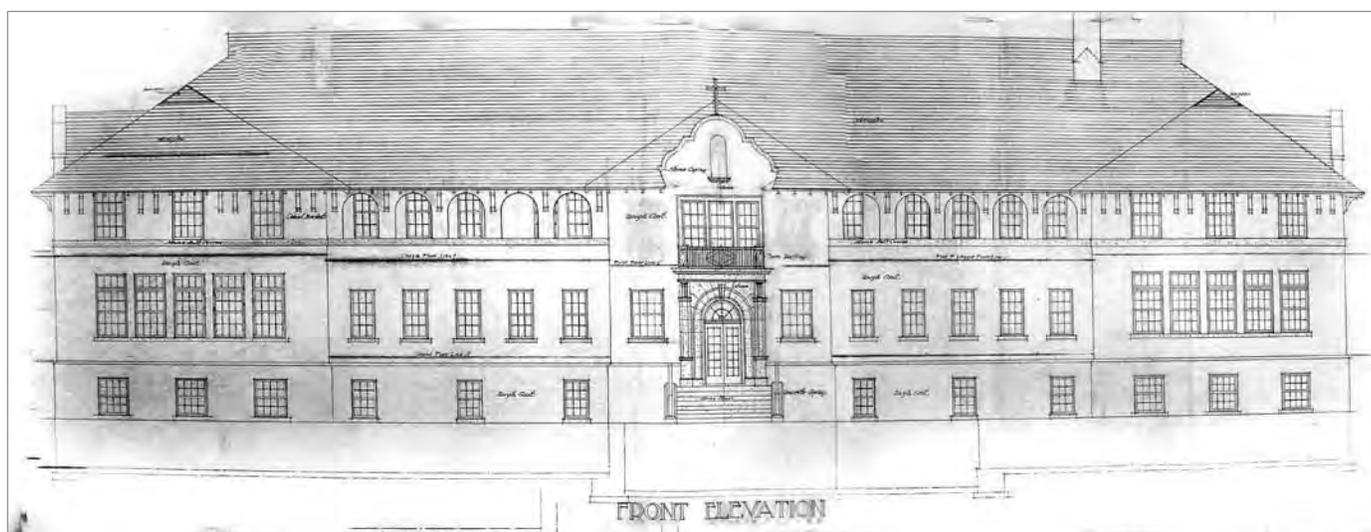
ARCHITECTURAL PLAN: ST. EUGENE INDIAN RESIDENTIAL SCHOOL, 1911, ALLAN KEEFER, ARCHITECT. FAÇADE ELEVATION. | © INDIAN AND NORTHERN AFFAIRS. REPRODUCED WITH THE PERMISSION OF THE MINISTER OF PUBLIC WORKS AND GOVERNMENT SERVICES CANADA (2009). SOURCE: LIBRARY AND ARCHIVES CANADA / INDIAN AND NORTHERN AFFAIRS / RG22M 77803 / 111 ITEM 1067.
